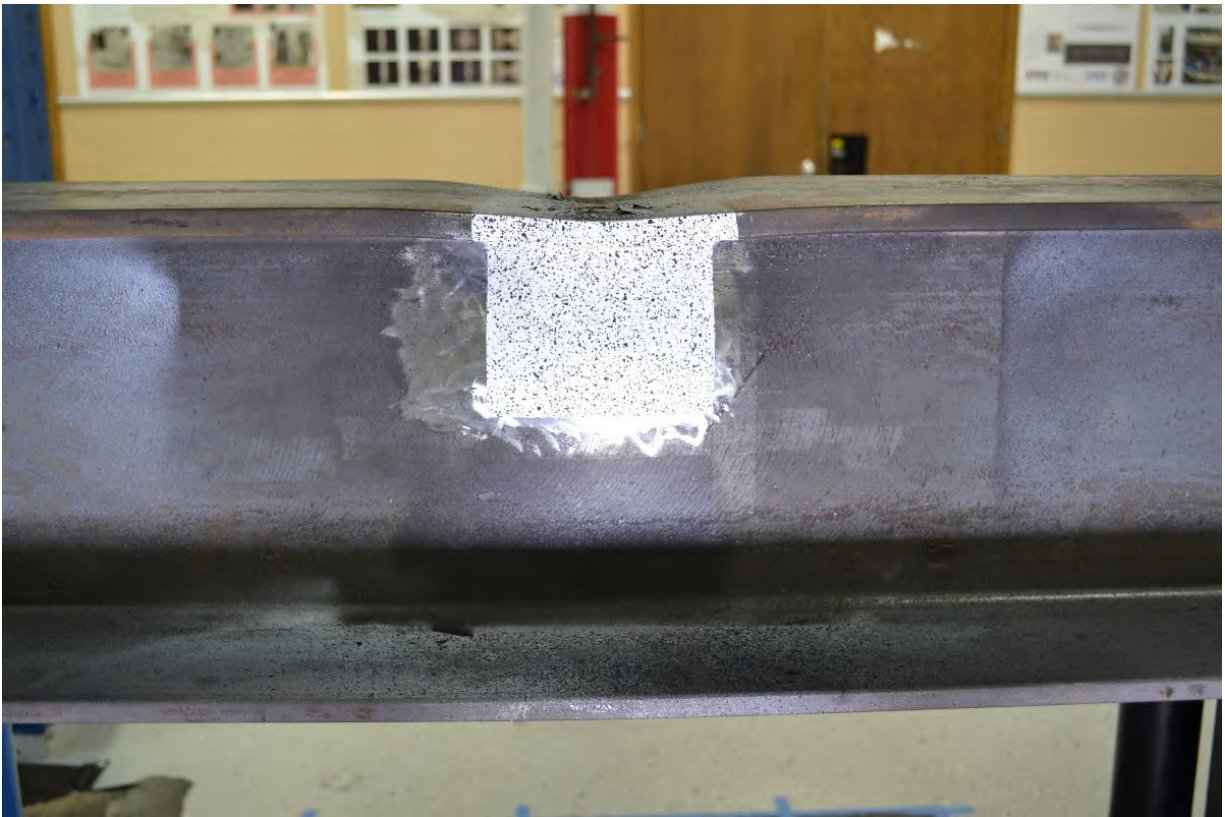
W10X19-SC-E0 after testing emphasizing flange and weld yielding
